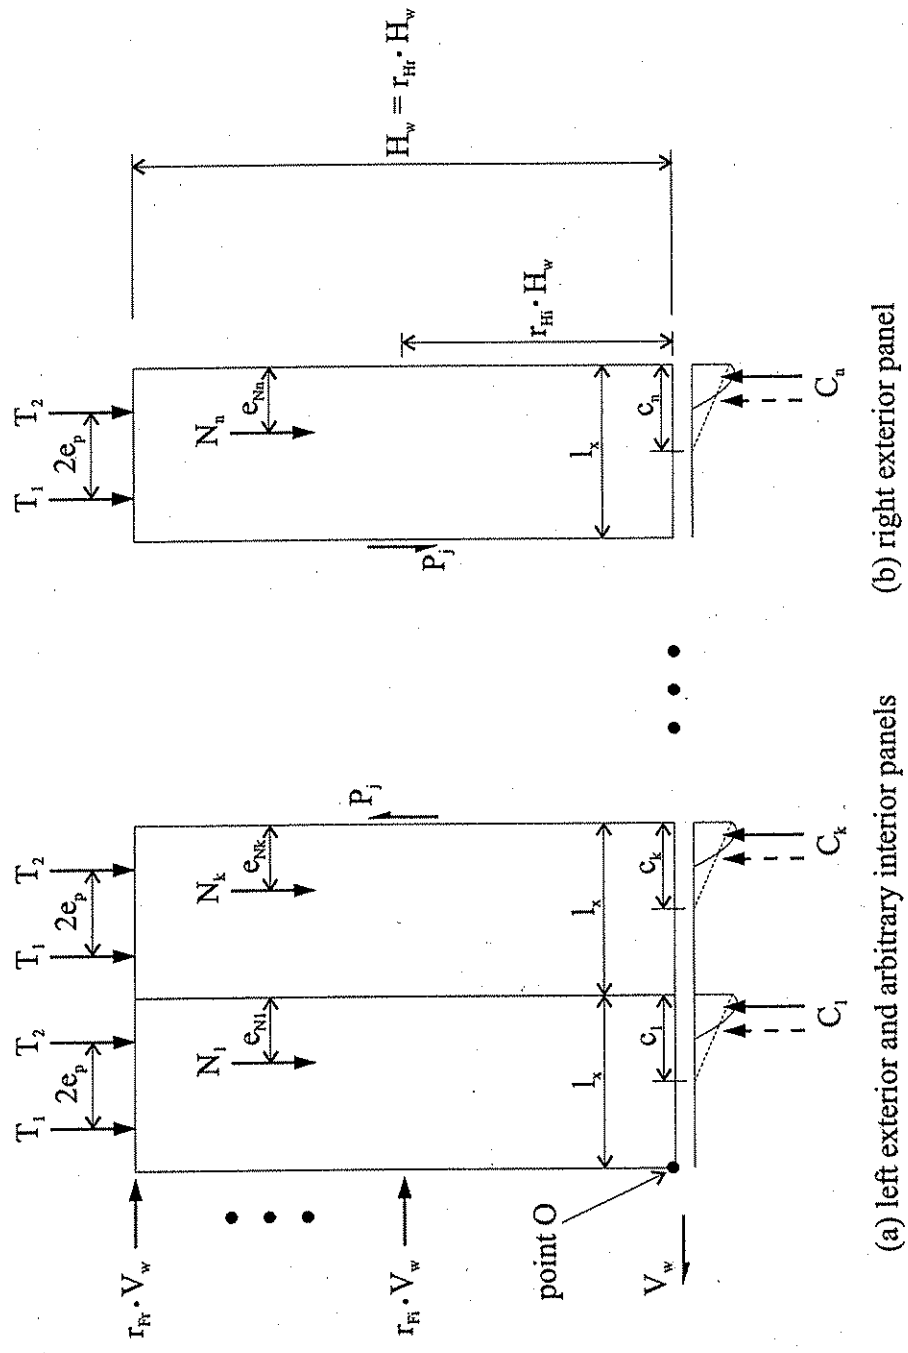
Forces on an unbonded post-tensioned precast concrete wall with multiple panels.
